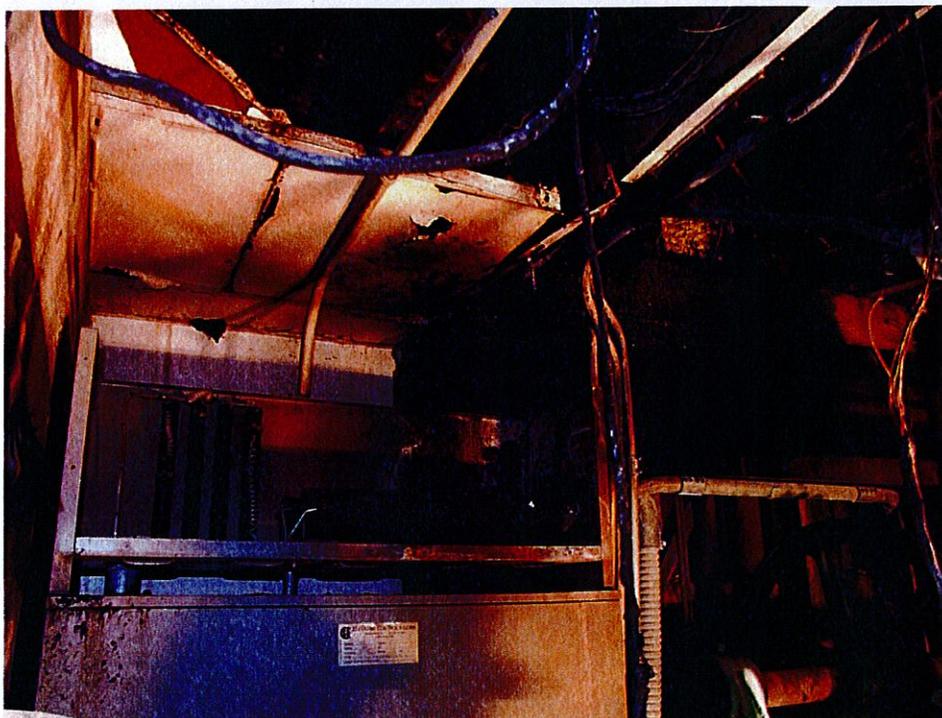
Image 49 (file DSCF0403.jpg). The north wall of the elevator machine room showing the top of elevator control and power equipment and the elevator hoist equipment on the right. The wood at the hoistway header is burned in a vee pattern that suggests more intense heat and heat movement from the direction of the controller. The metal access panel which normally encloses the upper portion of the cabinet has been removed. The two cylindrical control resistors are visible mounted within the metal cabinet. A circular heat pattern is visible above the general location of the resistors. Multiple vee shaped heat patterns can be seen bracketing the location of the resistors in the right-rear corner of the metal cabinet. An additional heat pattern (evidenced by the rusting of the metal enclosure) is visible directly below the resistors.
